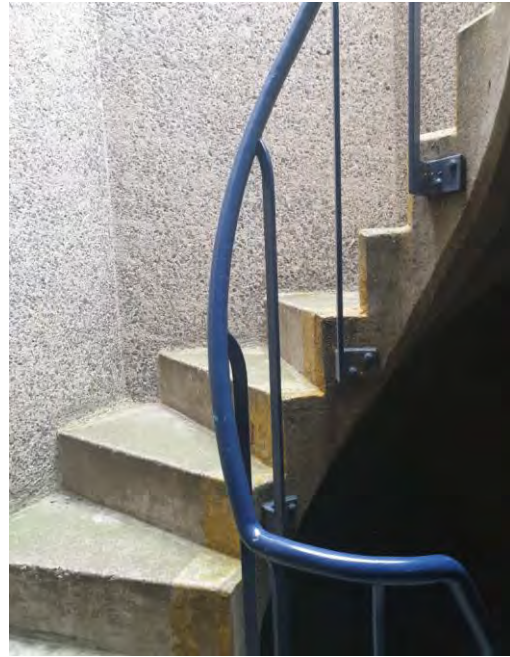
Helical stairs extending from the fire-fighting stairs to Roof level
